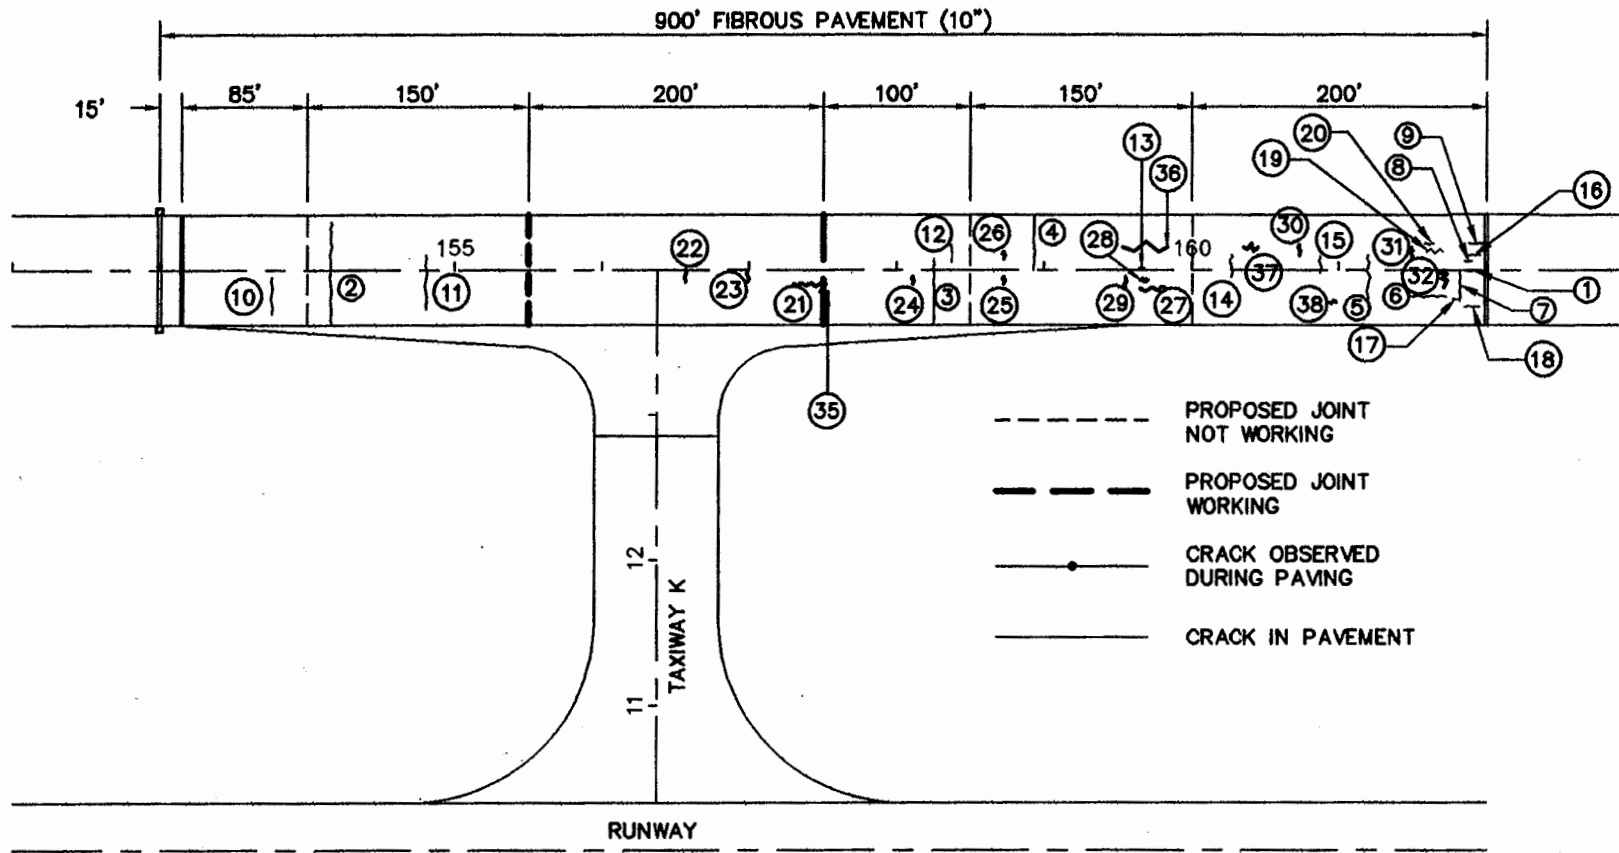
CRACKS IN FIBROUS PCC PAVEMENT, SPRING 1998
